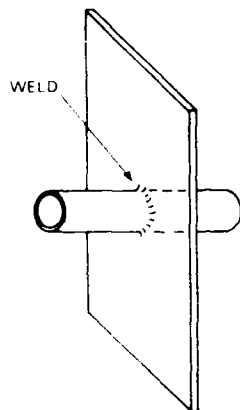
Entry plate treatment of conductive plumbing at facility and terminal interfaces.
